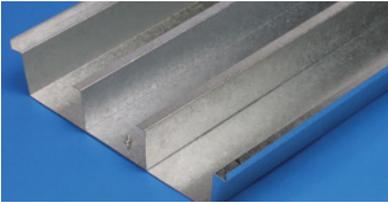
Screed under-floor ducting. The pre-formed tray is produced from galvanised mild steel and a 12mm plywood cover. (source: <http://www.pendock.co.uk/>)
